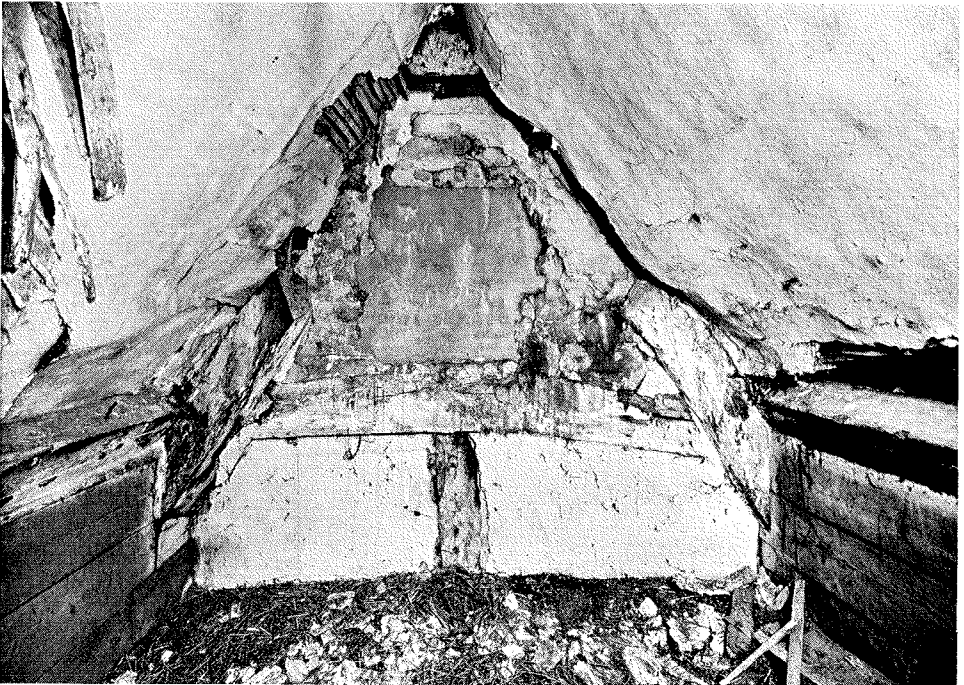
PLATE IVb. South roof space looking S showing top of cruck blades in truss c-c'.
